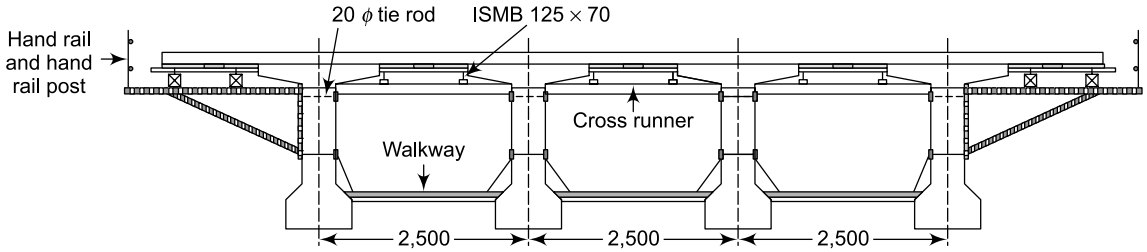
Formwork Arrangement for Deck Slab Supported on the Girders.
